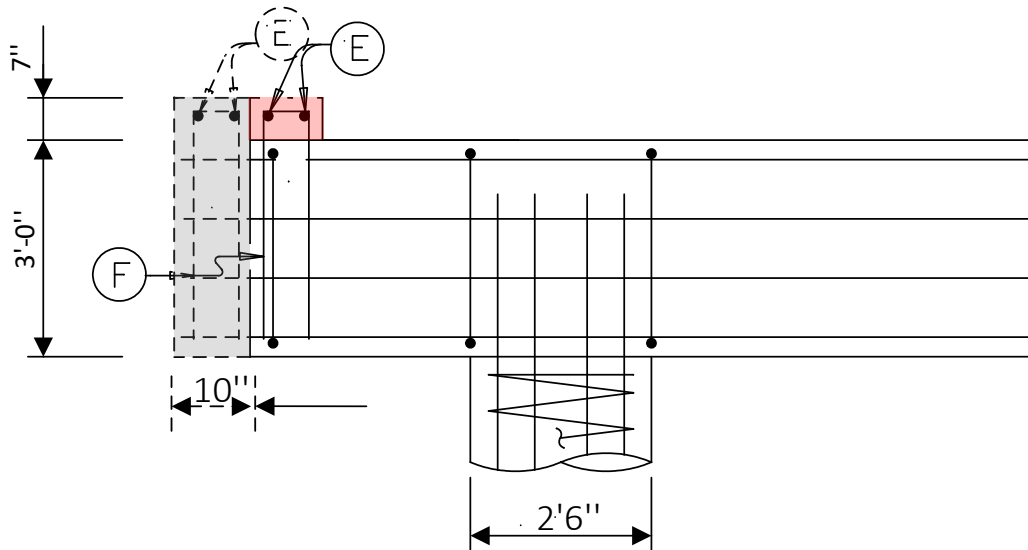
Modified earwall for slab beam bridge (elevation)
